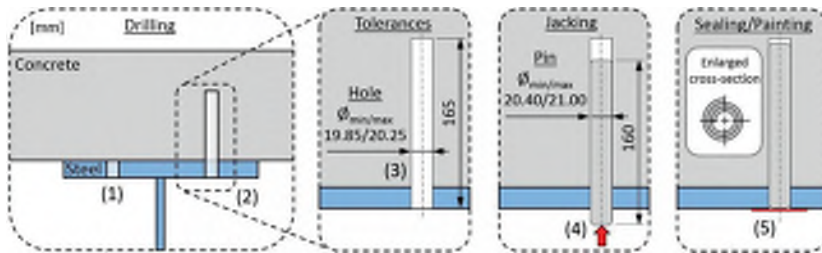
General installation procedure for CSPs in steel-concrete bridges
